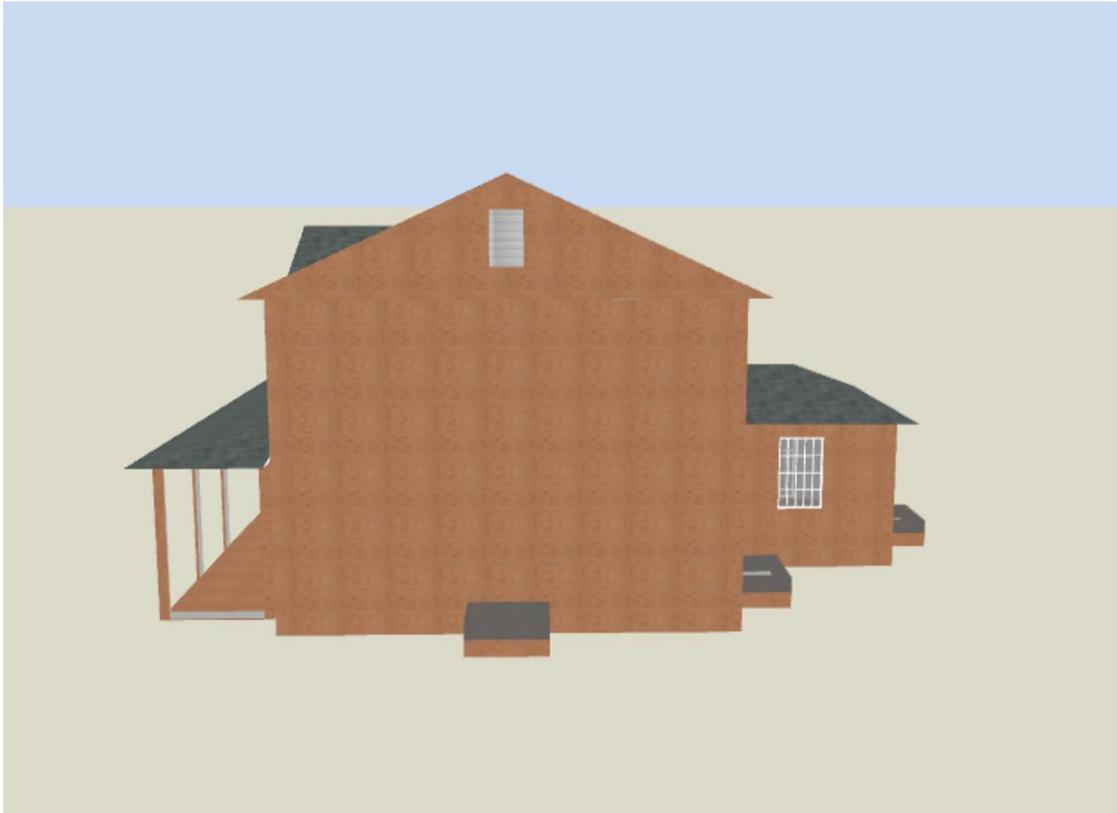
Rendering - Right elevation view of MH.
